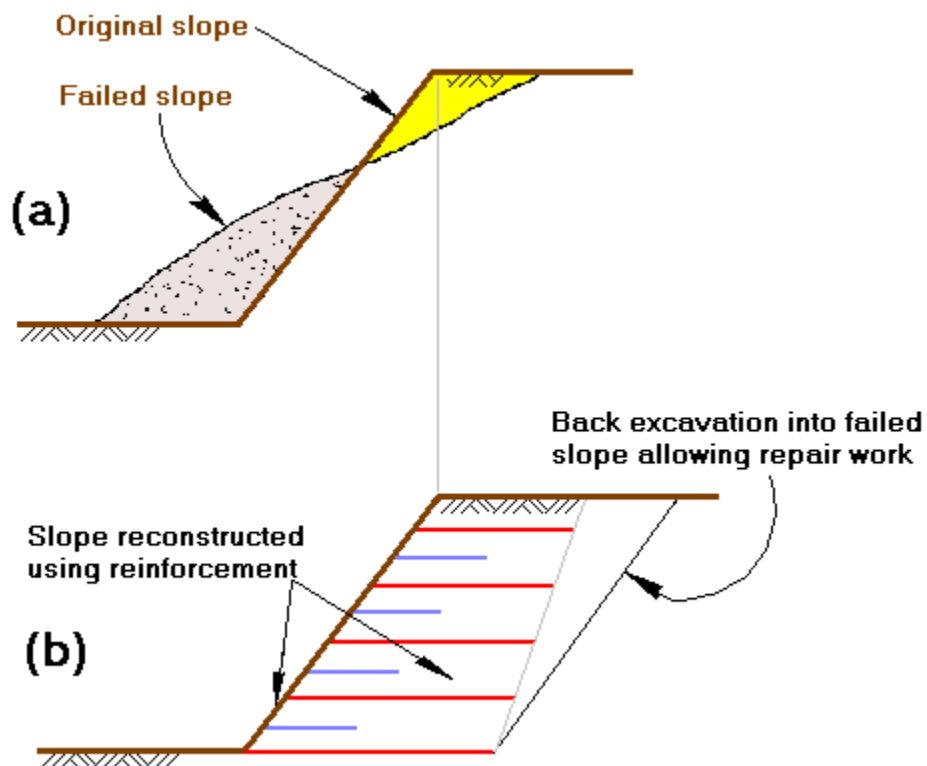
Slope repair: a) Failed section, and b) Reconstructed slope (may be deeper than, or same as, original grade)
